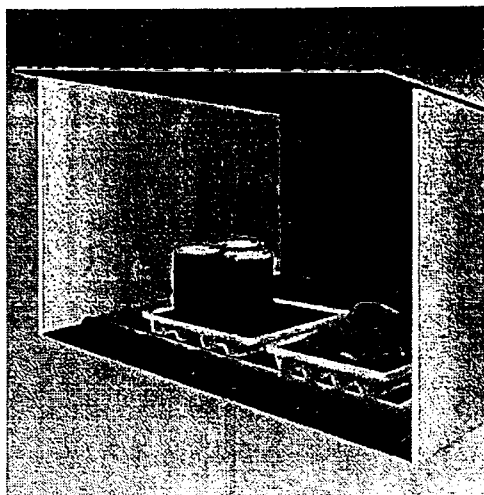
Illustration showing construction materials with secondary containment and overhead cover to prevent stormwater contamination.
